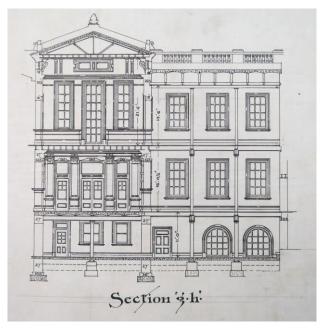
Section G-H of Link Building (generally as constructed) showing the internal face of the eastern
